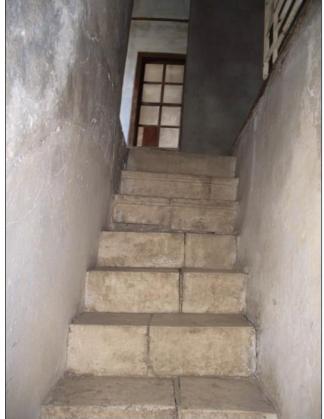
The 3 steps added to the arched stone staircase that provides access to the upper floor and the vault-stair level relationship
